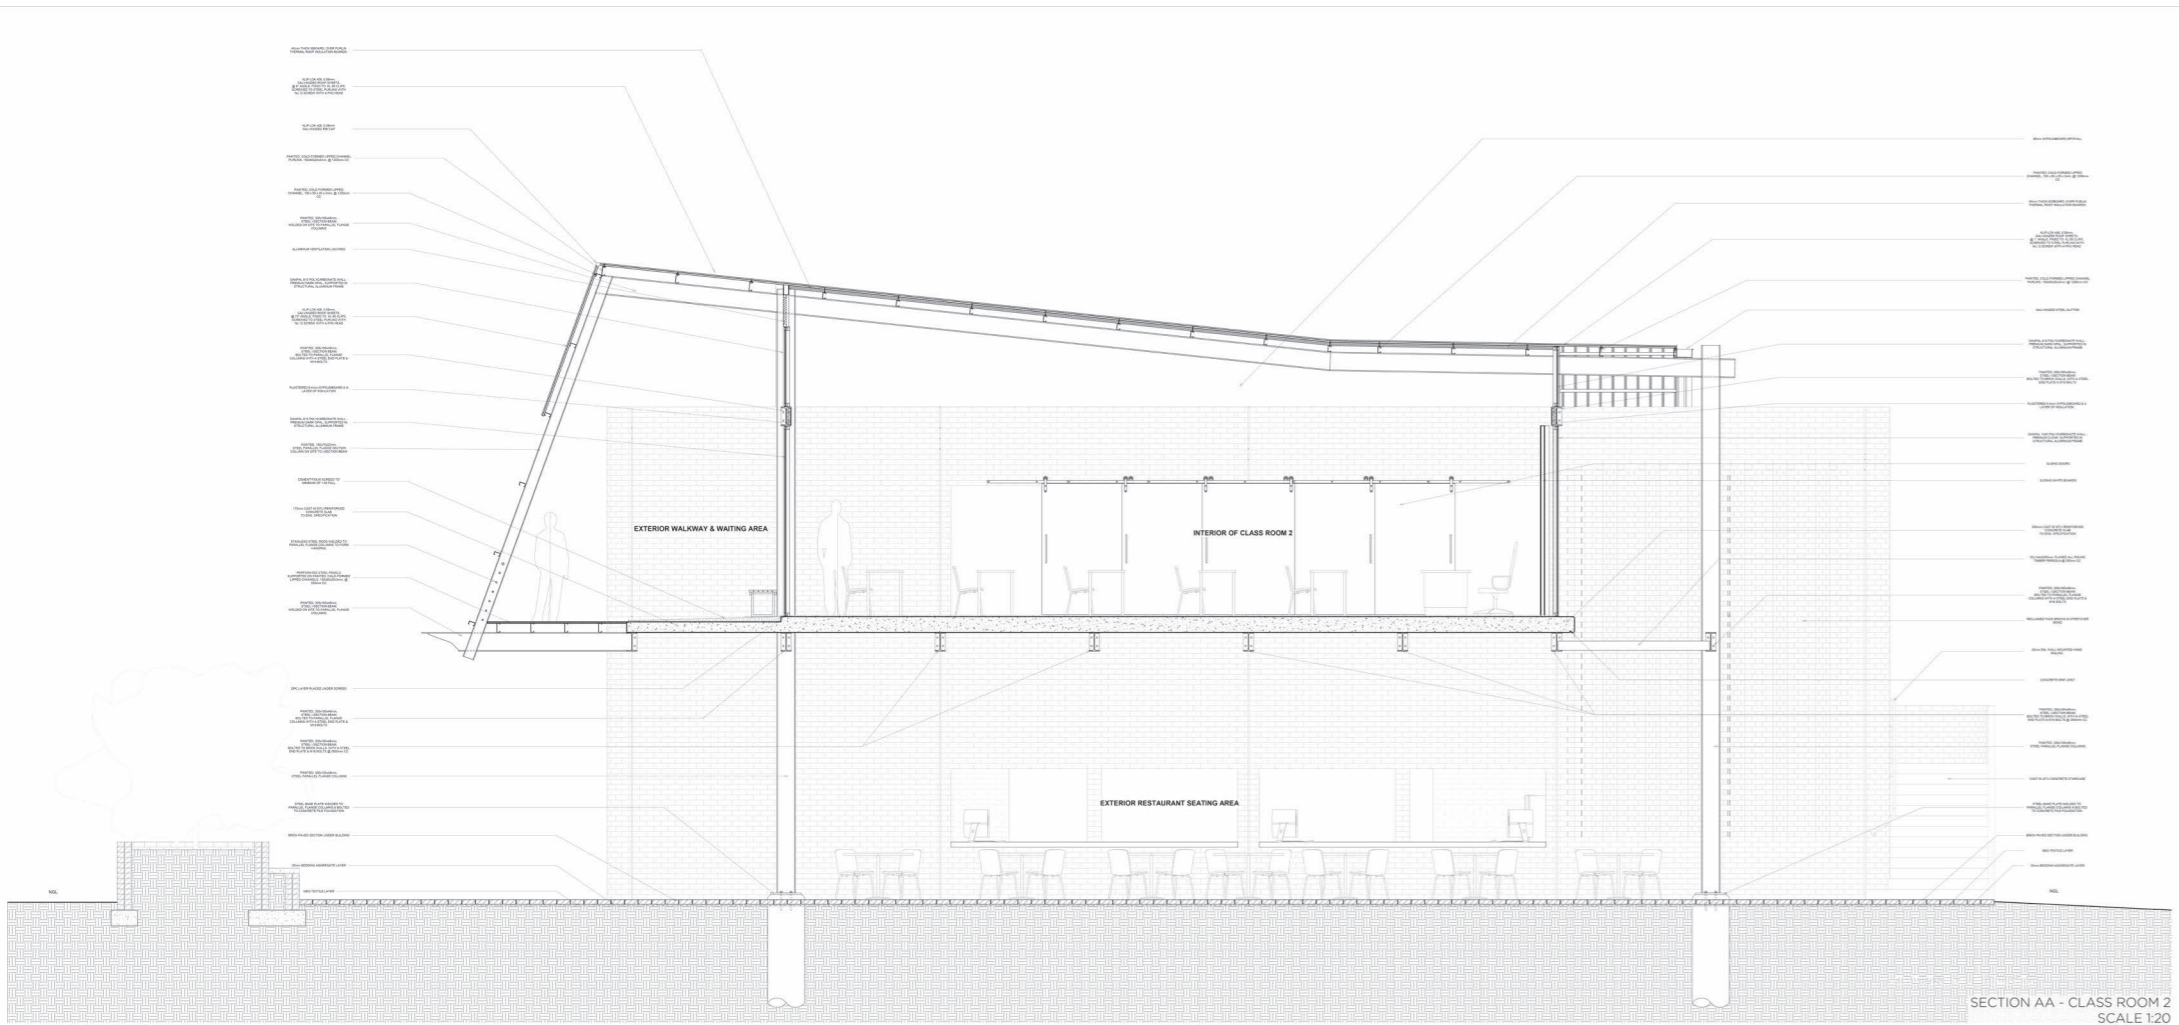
September Crit section - AA through class room (Author, 2018)
